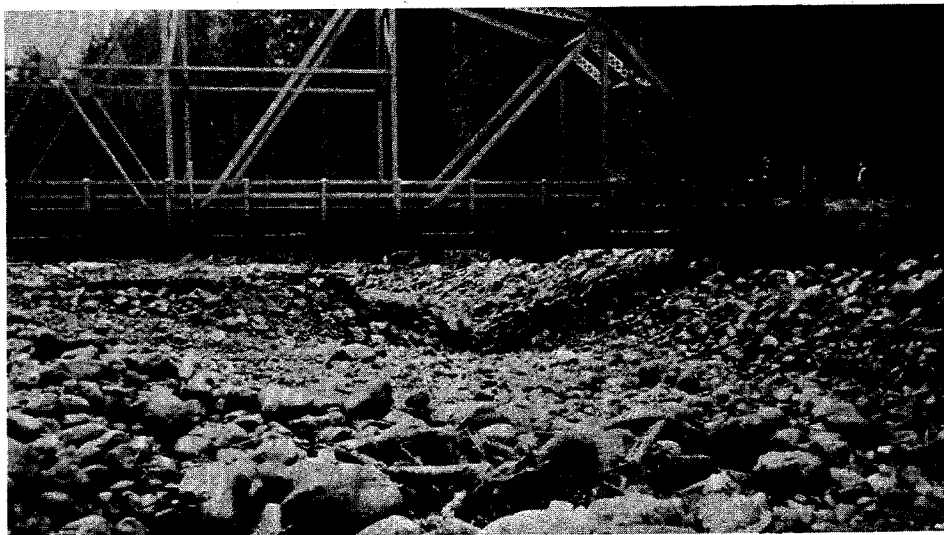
Downstream view showing right-bank abutment of Forest Service bridge 394-2.4, December 22, 1976.
